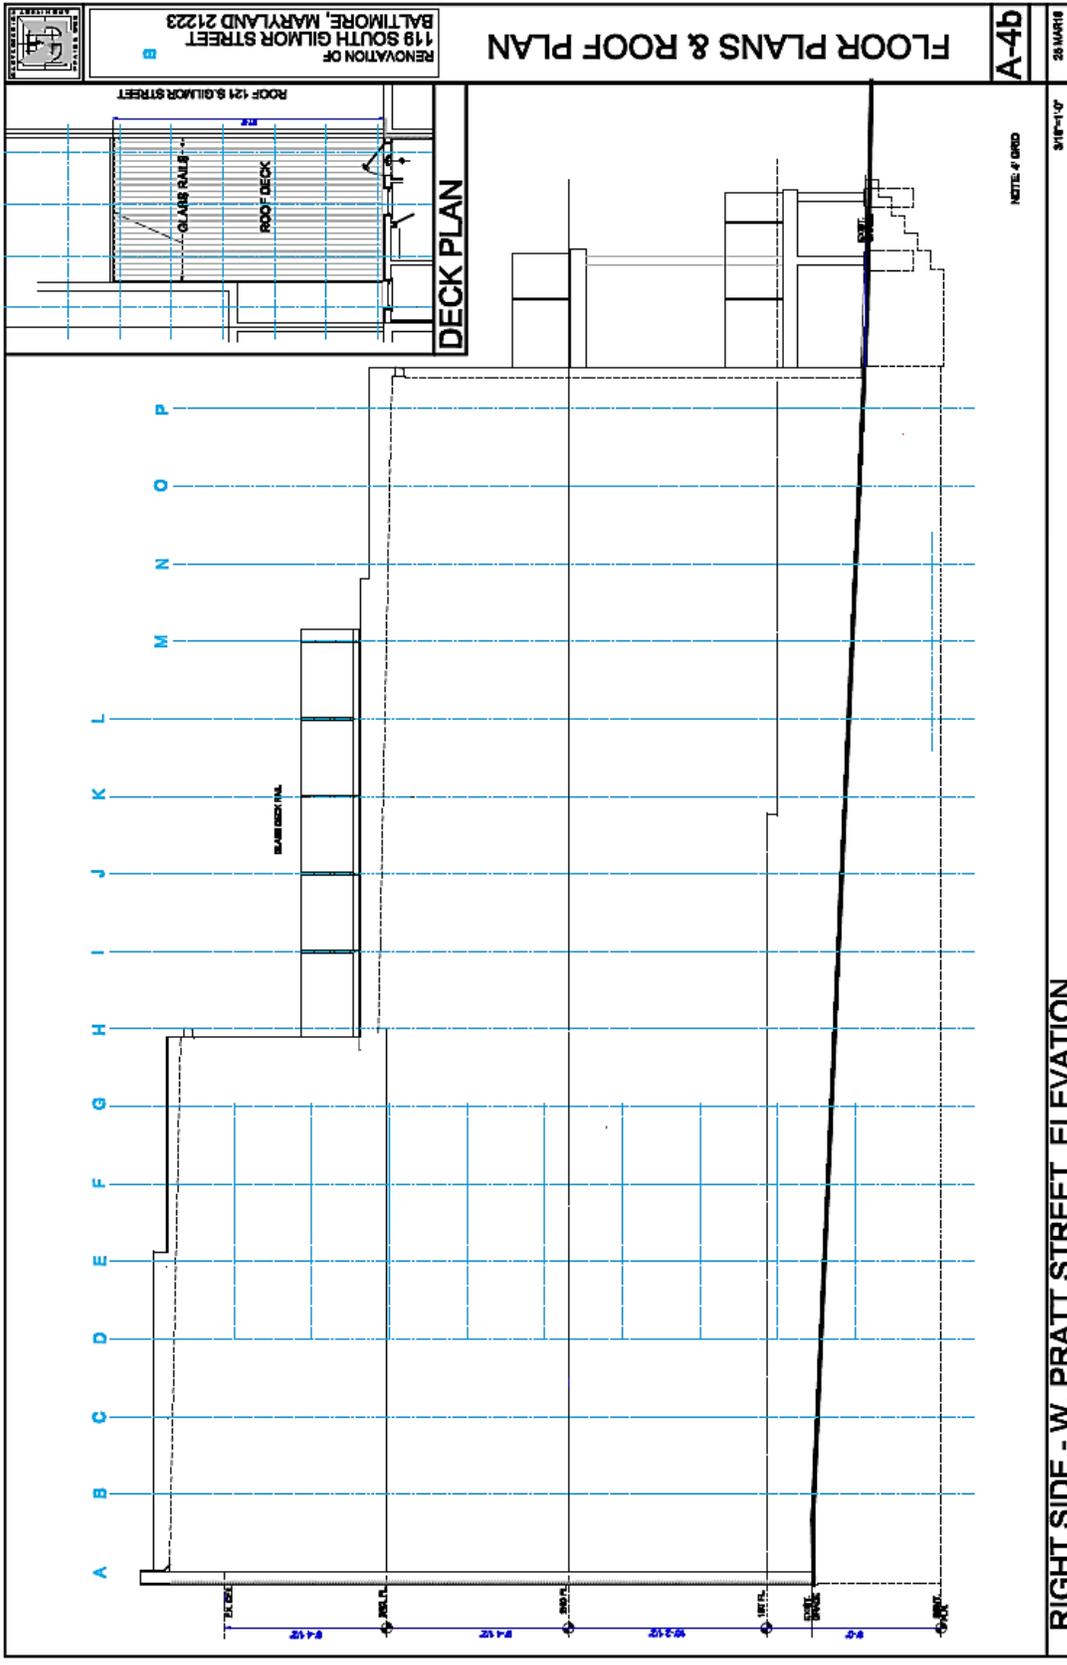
W. Pratt Street (south) elevation and rooftop deck plan, 119 S. Gilmore Street, March 25, 2018
